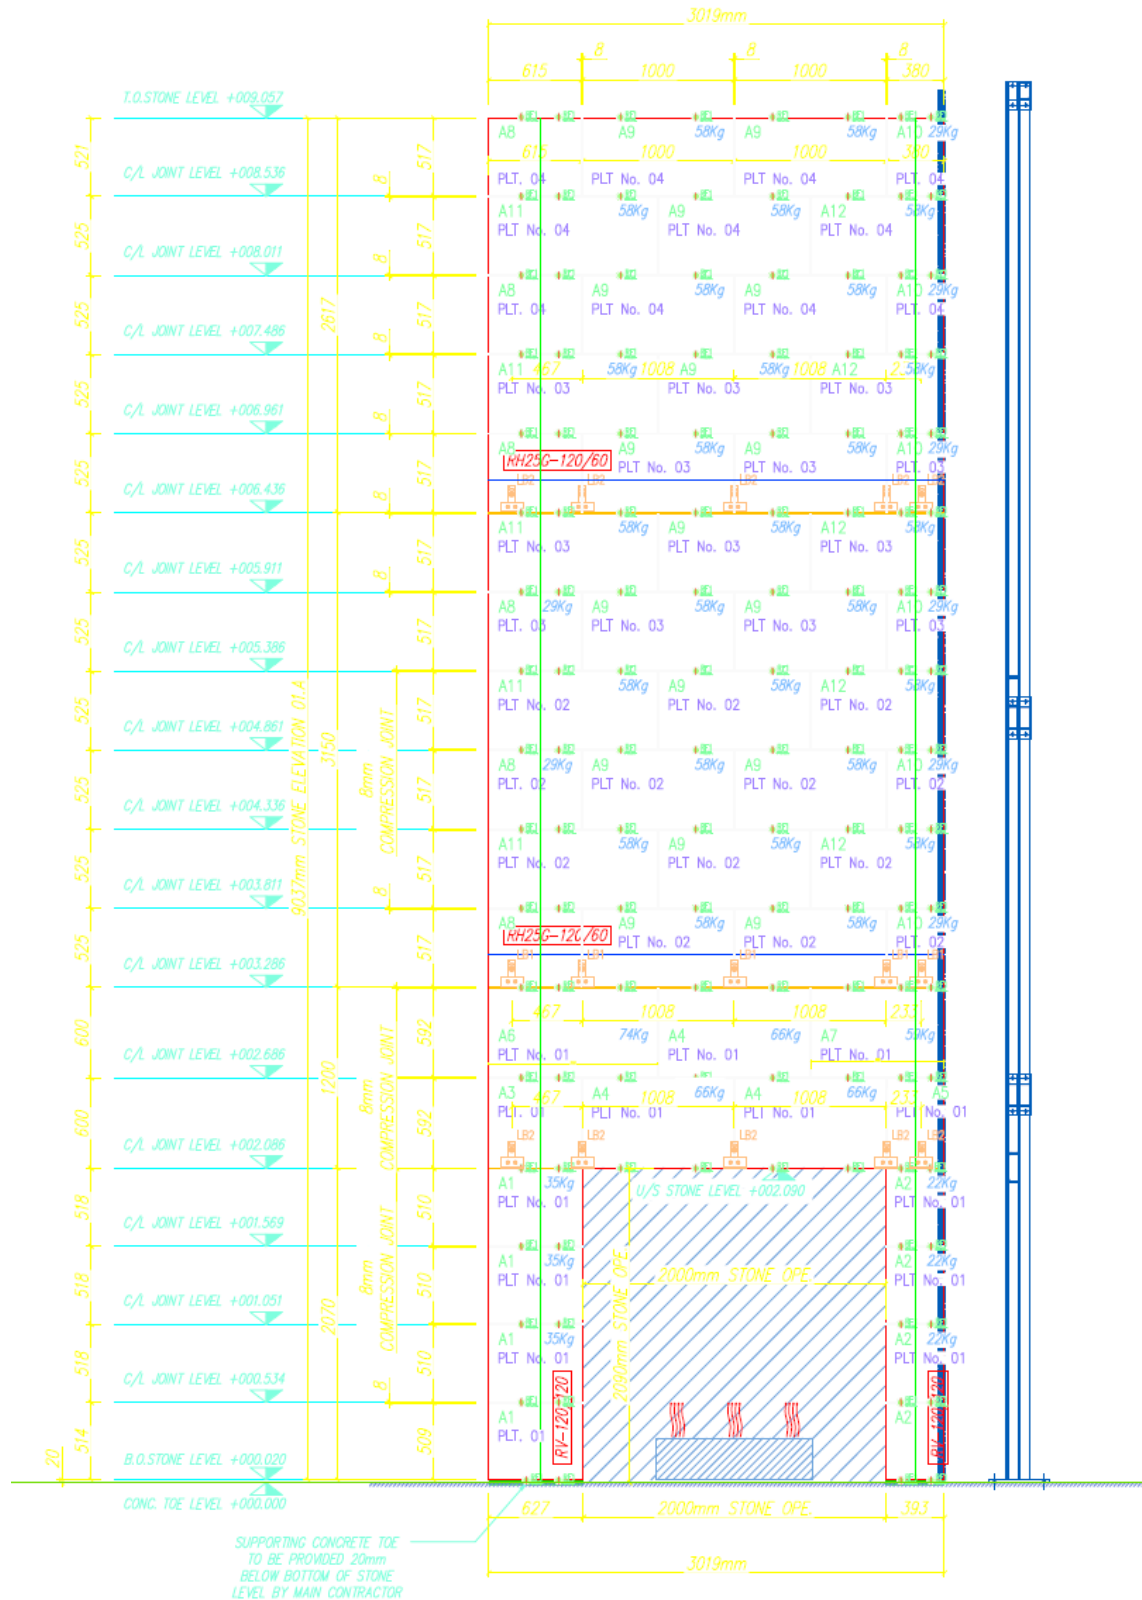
Sketch of the tested facade. Front elevation layout.
